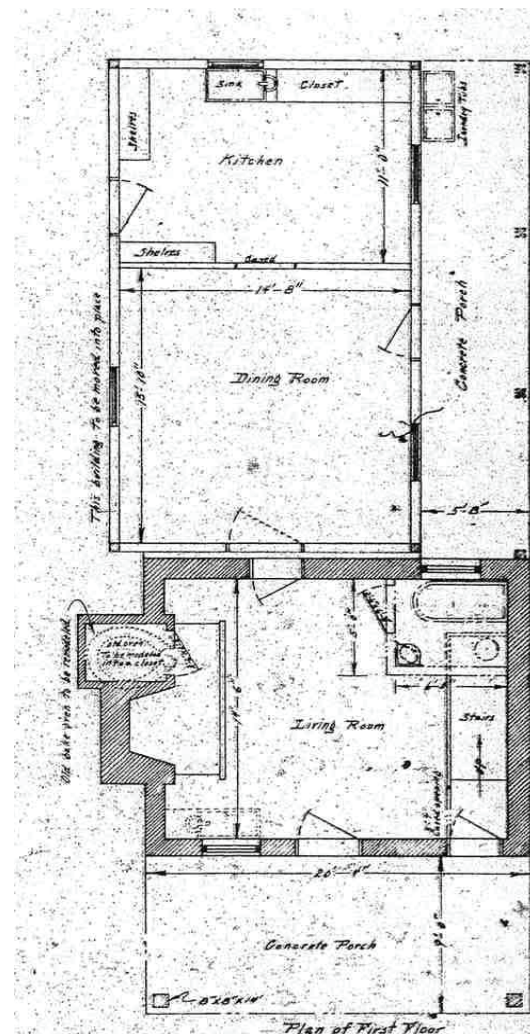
Close-up of Kitchen floor plan from 1922 "Repairs & Improvements" to Assistant Keeper's Dwelling.
